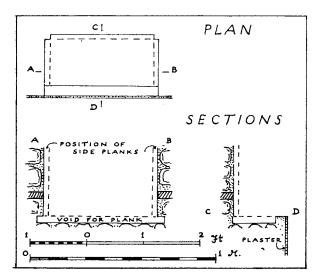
Insula XXII, Building 1: plan and sections of niche in cellar (scale 1:20).
